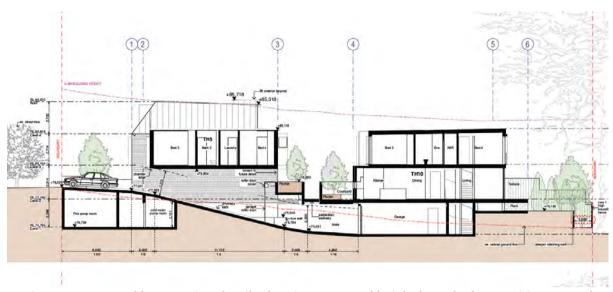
Proposed long section details showing proposed height breach above exiting ground level to Wheatleigh Street row of dwellings.
